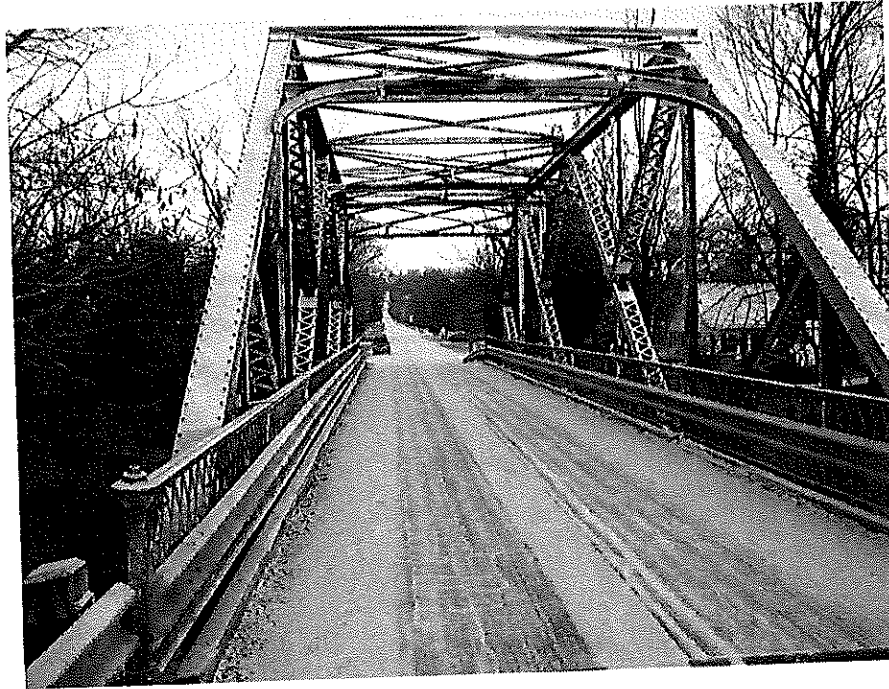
Collingwood Street Bridge (Bridge #000141) looking North from the South Edge of the Bridge
